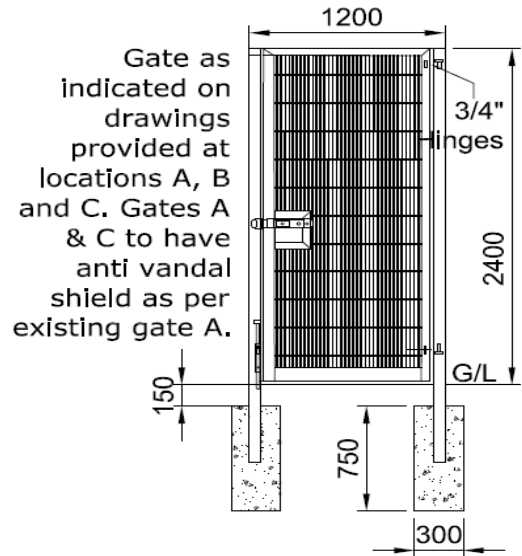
Proposed Fence and Pedestrian Gate Elevations
